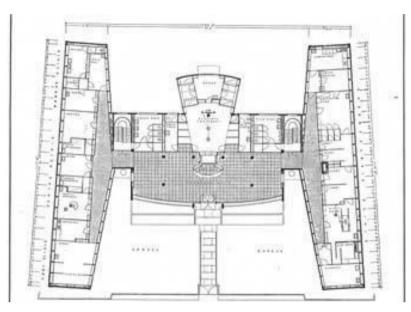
Ground floor plans for Finsbury Health Centre - London Source: (Phillips, 2000)
